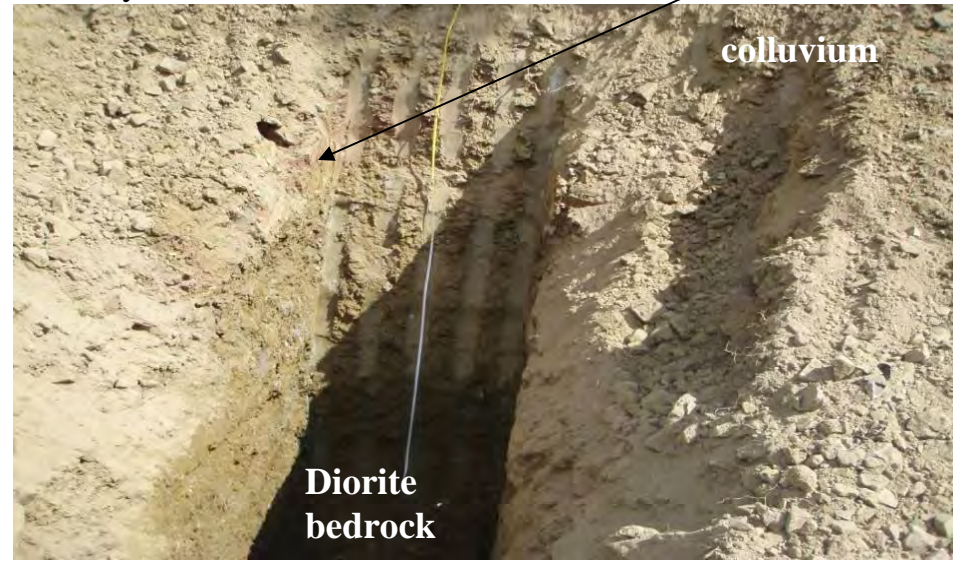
09-SGTP-8 looking East. Alluvium layers in the test pit located below the Shave Gulch access road.
